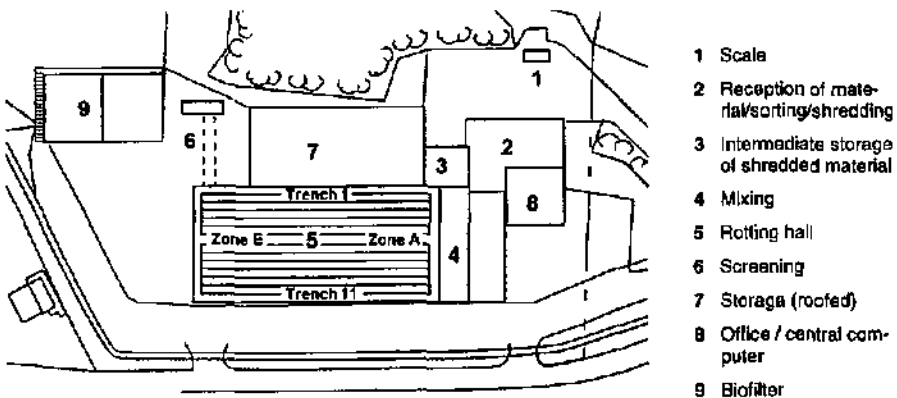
Schematic plan of the installation at Krauchthal (KEWU).
